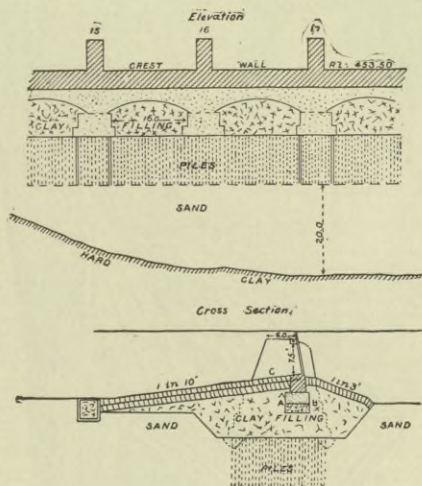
ELEVATION AND CROSS-SECTION OF SIDHNAI WEIR, INDIA.
